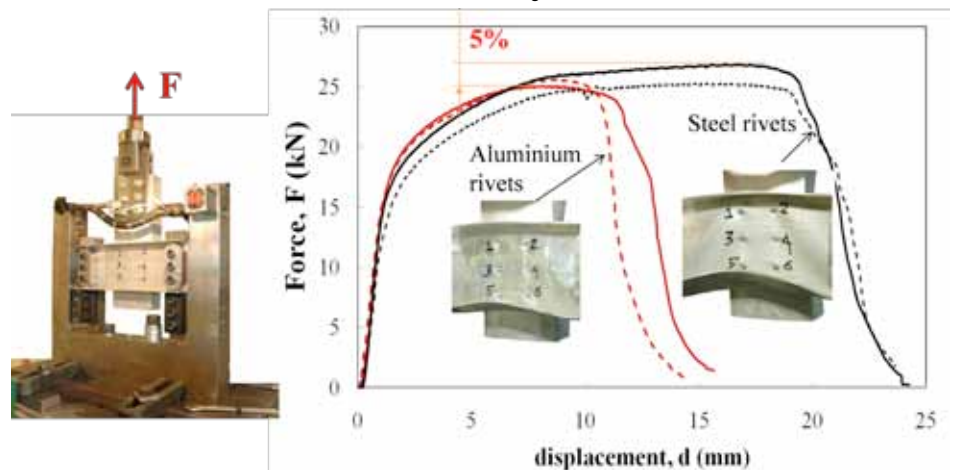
Comparison between T-components using aluminium rivets and steel rivets.
